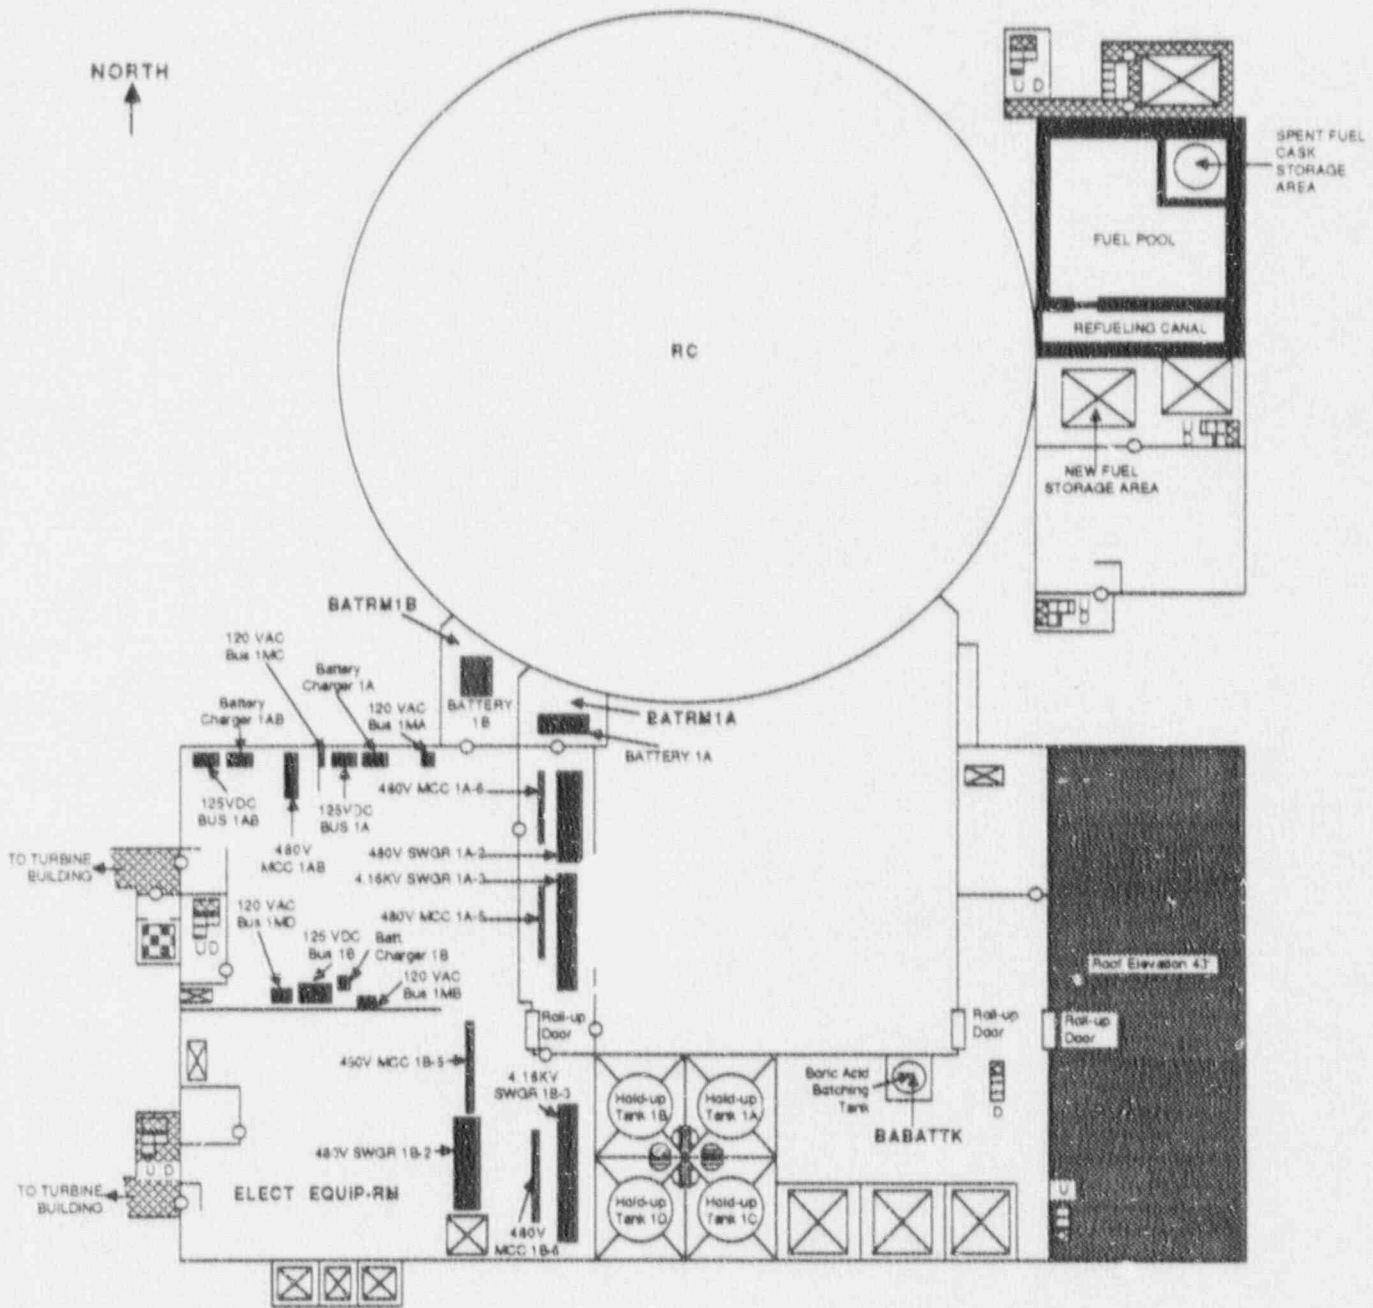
St. Lucie 1 Reactor Building, Elevation 45', Auxiliary Building, Elevation 43', and Fuel Handling Building, Elevation 48'
